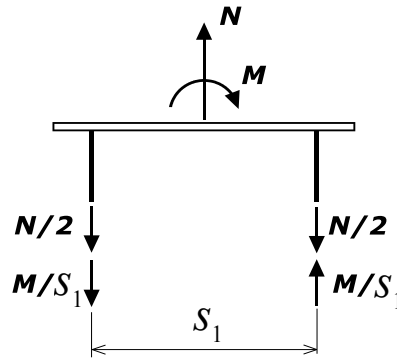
Side view of an anchor plate with four anchors subjected to a tension load N and a bending moment M applied in the centre of the plate.
